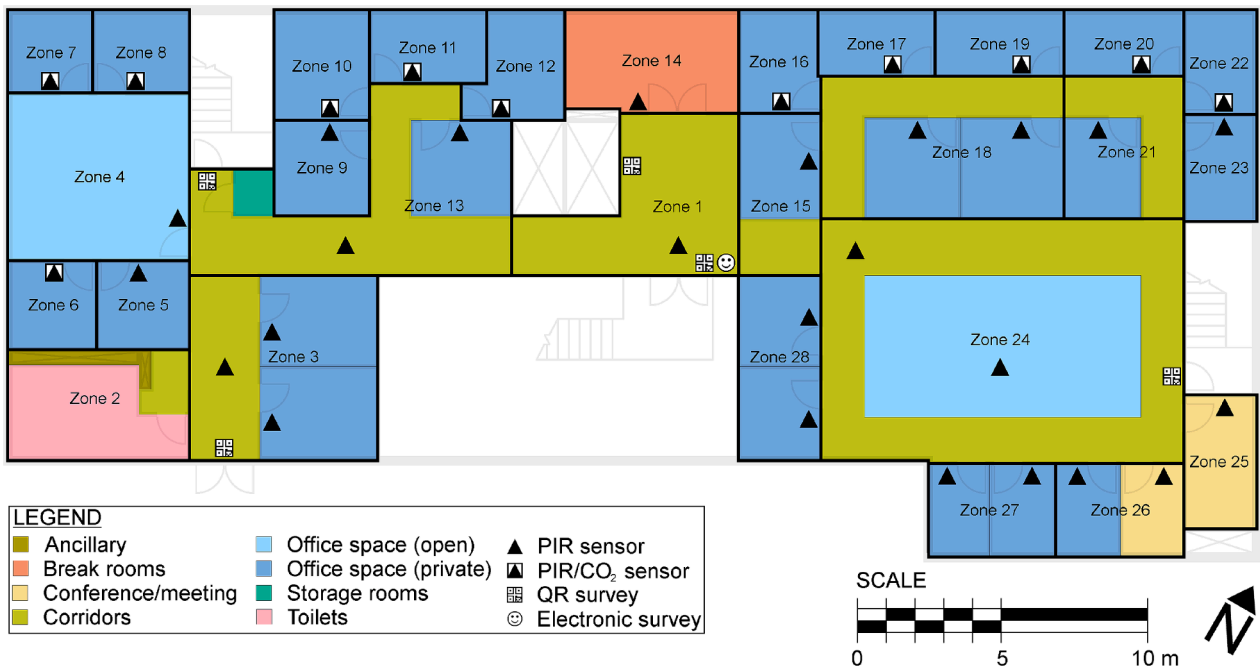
Case study building floor plan, sensor locations, and VAV zoning.
